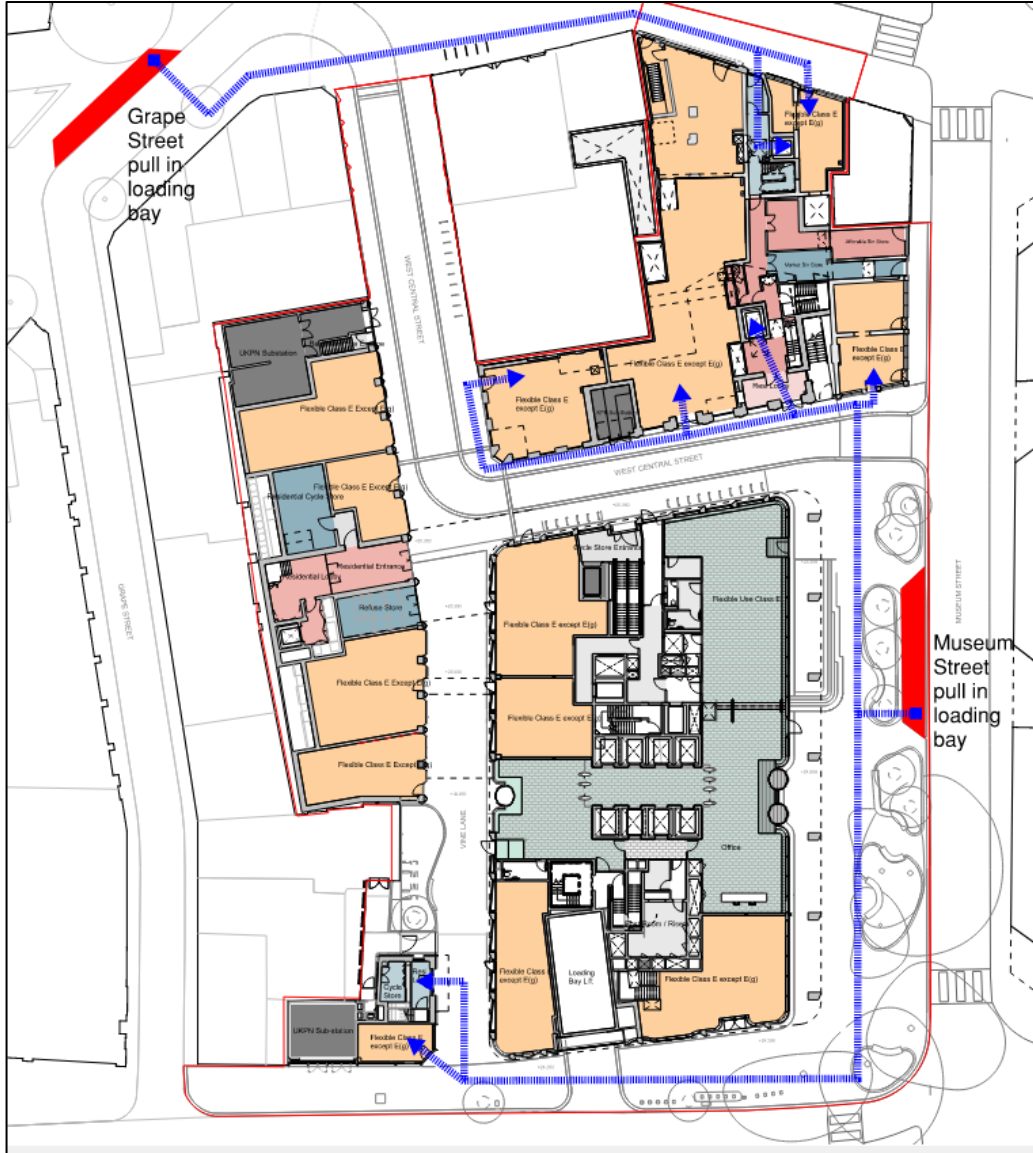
West Central Street & High Holborn upper floor goods distribution routes from on-street loading locations
